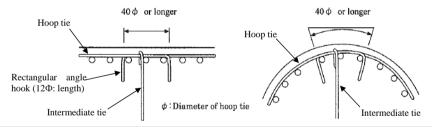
Anchorage of Hoop Ties with Rectangular Angle Hook
